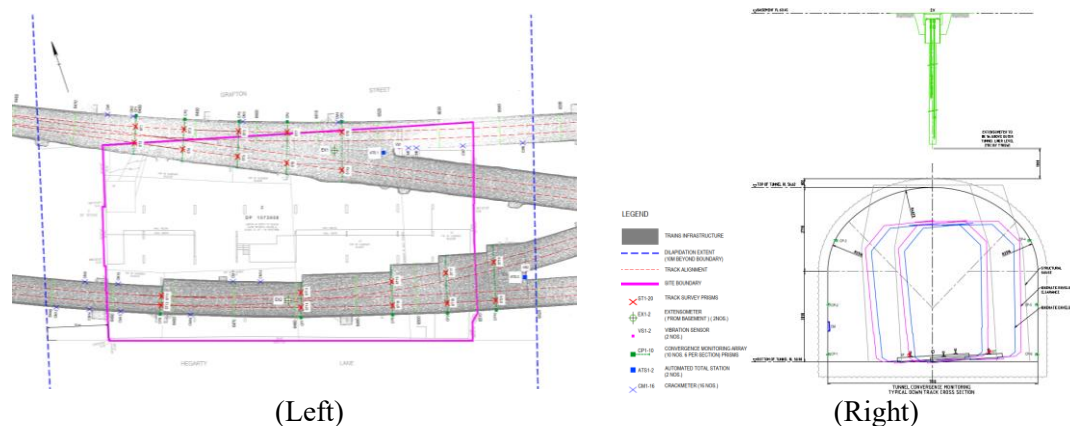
(Left) I&M implementation plan. (Right) Cross section showing the instrumentation details with kinematic envelope.
